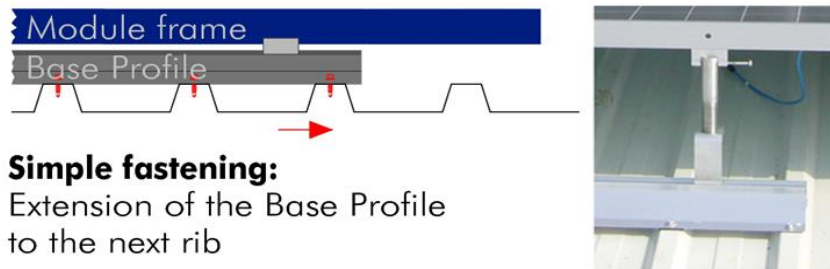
Detail on the fastening the base profile of trapezoidal sheet
